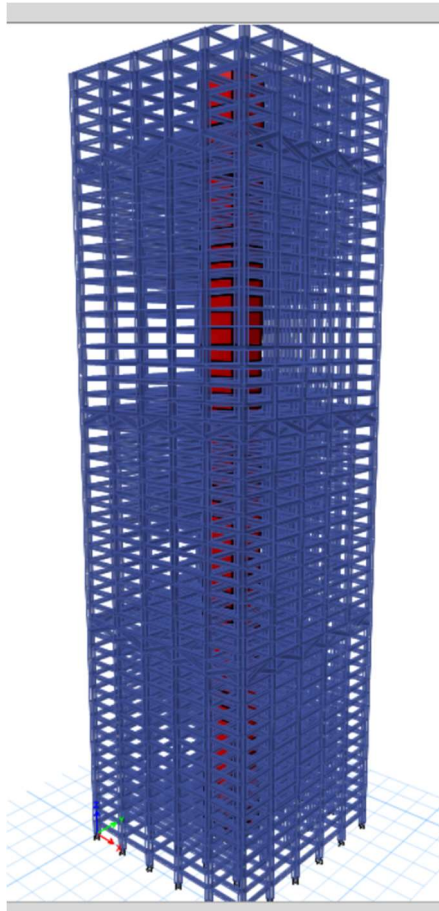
3D view of frame with centre core outrigger and belt truss.
